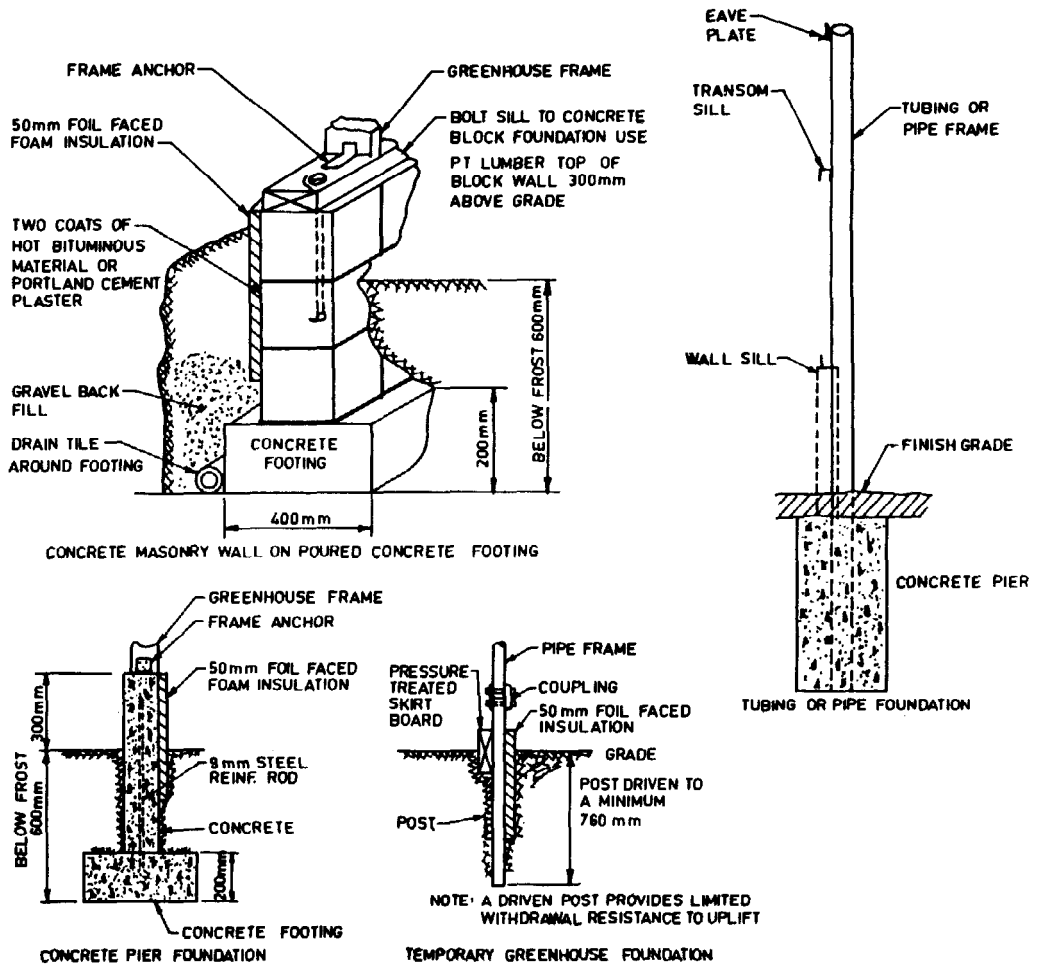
TYPICAL FOUNDATION FOR GREEN HOUSES
